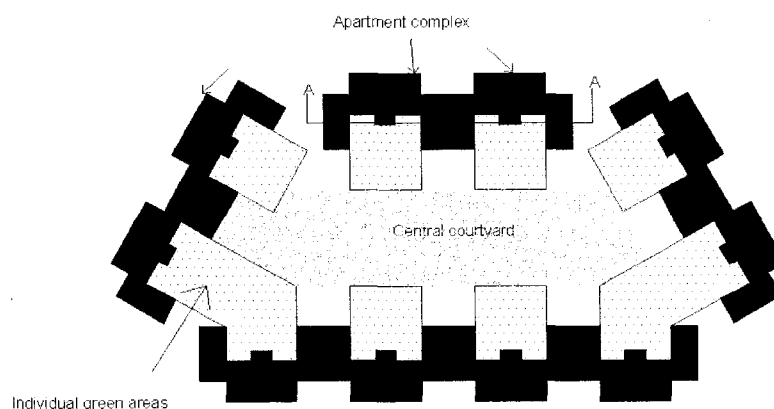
Plan showing arrangement of medium scale buildings around central courtyard.
